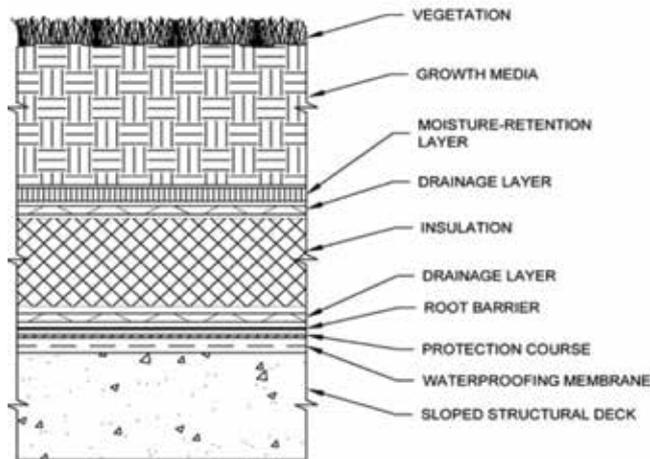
A vegetative roof system with an inverted assembly and drainage layers above and below the insulation
